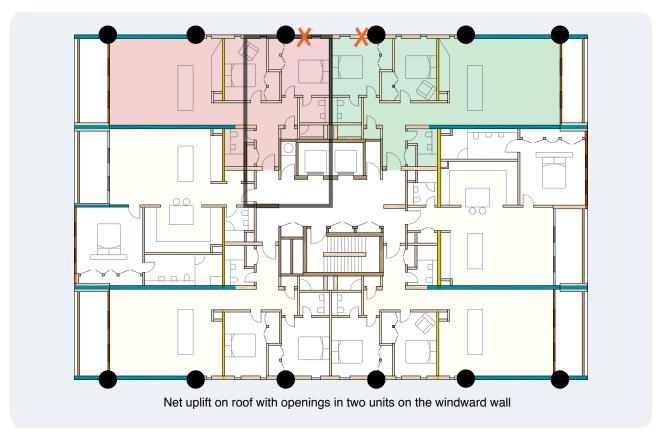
Net uplift on roof with openings in two units on the windward wall.
